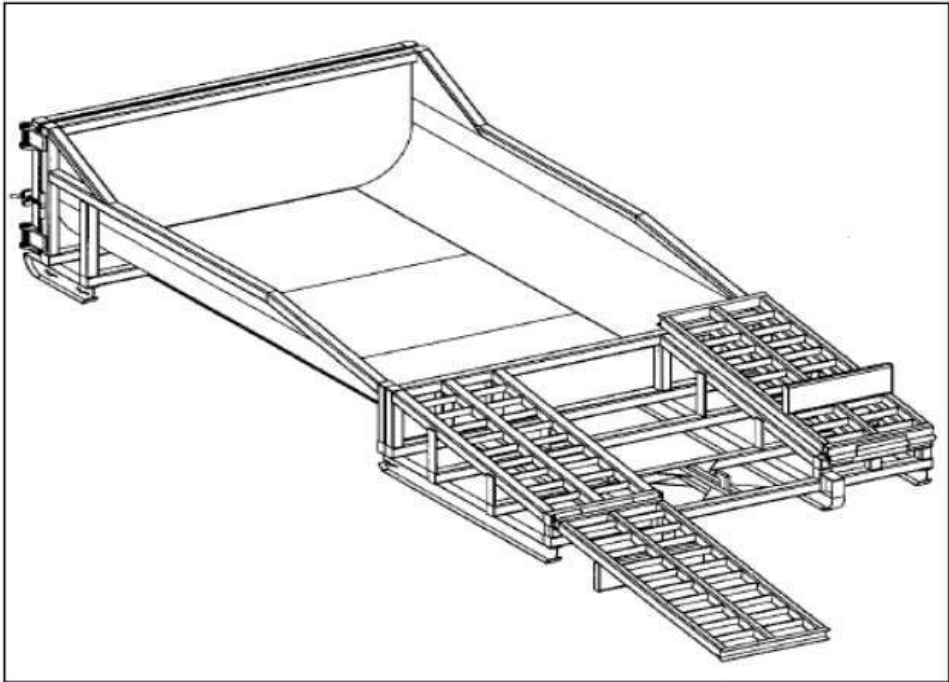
8: Prefabricated Concrete Washout Container with Ramp
